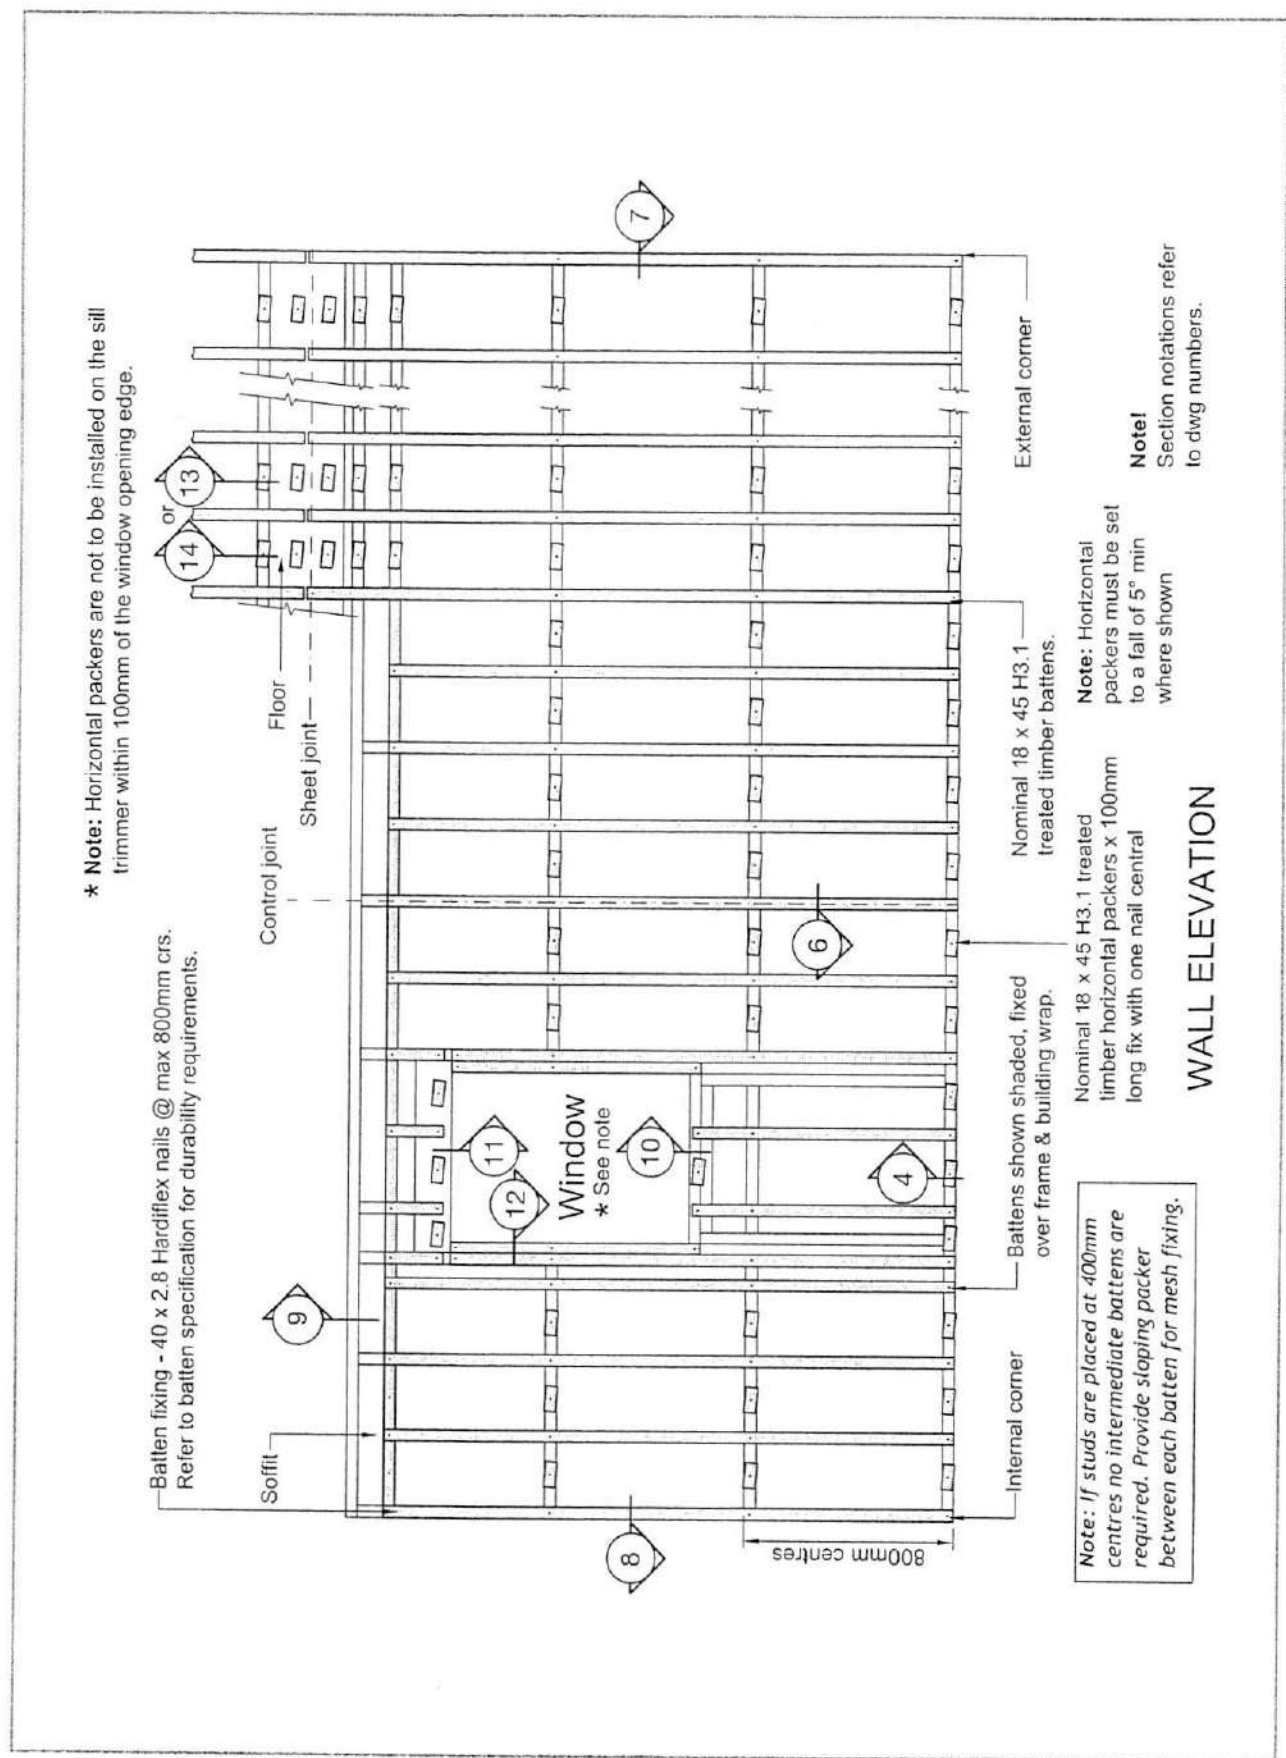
CAVITY TYPICAL FRAMING AND BATTEN SETOUT
